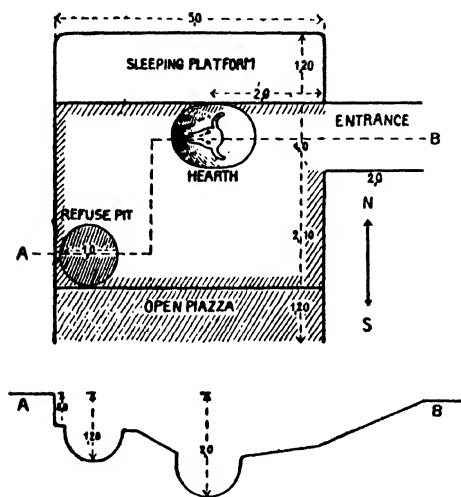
GROUND PLAN AND SECTION OF A NEOLITHIC HOUSE AT GROSSGARTACH, SOUTHERN GERMANY.
